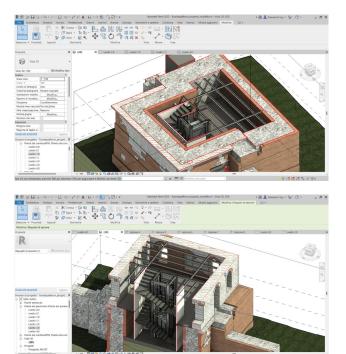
screenshots of the design in Revit. Horizontal section with details of the HE beams (top); axonometric view with vertical connection system, stairs, and elevator (bottom)
